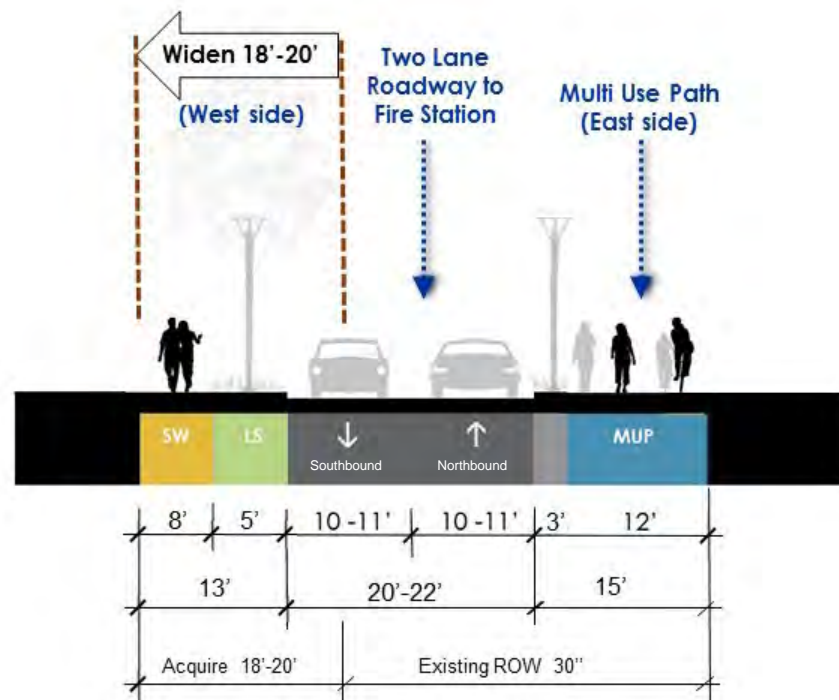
Typical Section Hartford Dr. Segment 1 (Grade Rd. to 21st St. NE)
